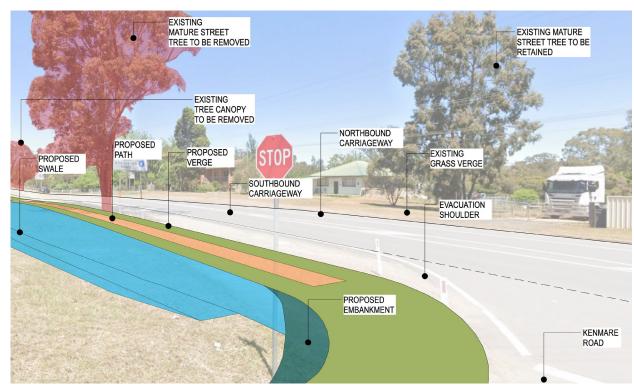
Viewpoint 8 - Intersection of Kenmare Road and Londonderry Road (facing south west) - Proposal view
